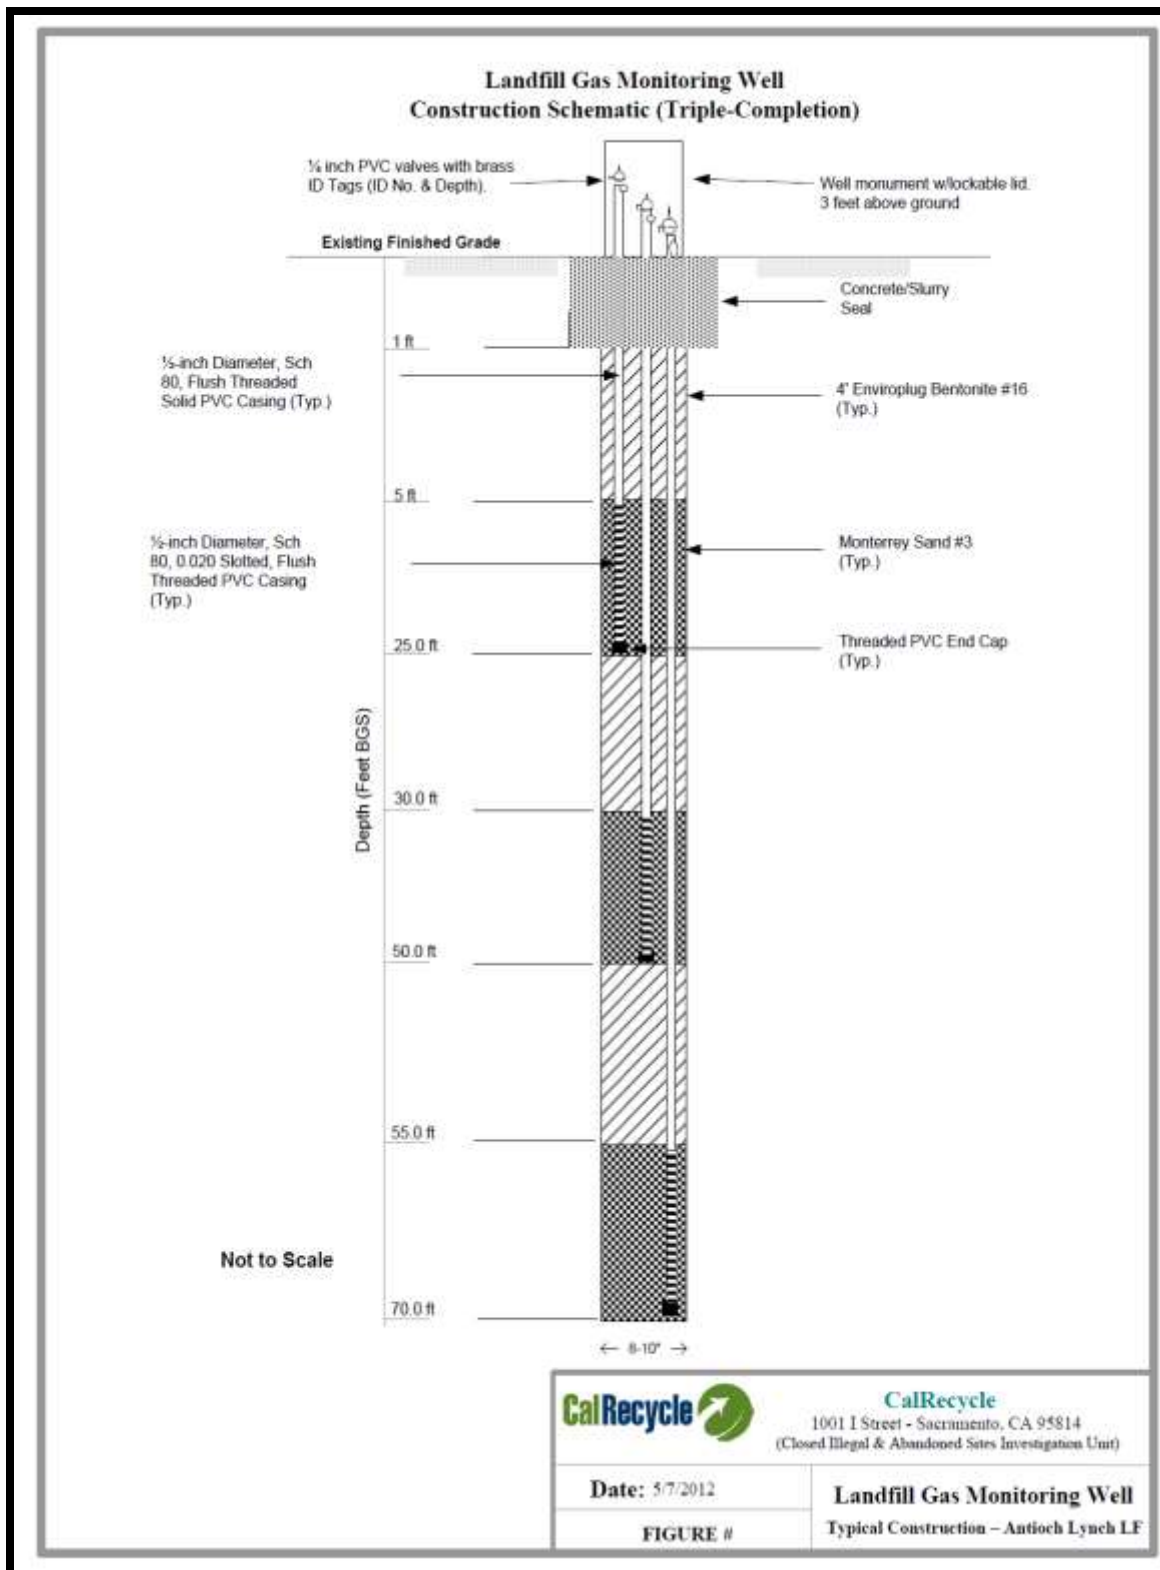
Drawing showing typical construction of a triple-depth landfill gas monitoring well
